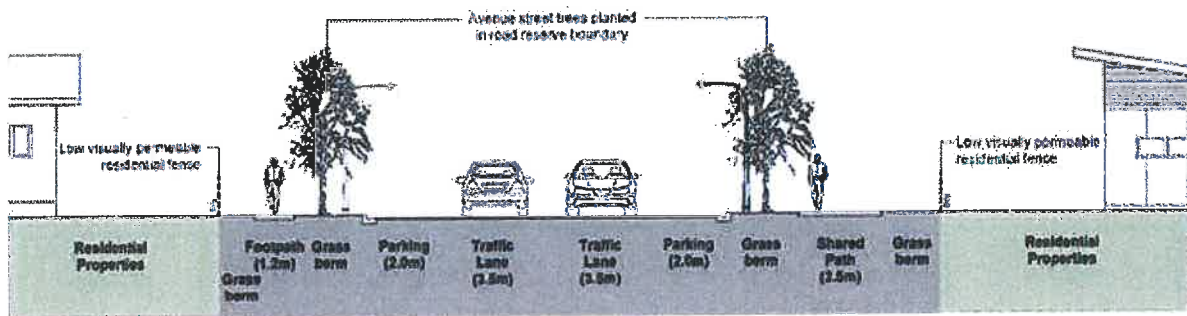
F: Cross section of Collector and Secondary Collector Roads in the General Residential Zone
